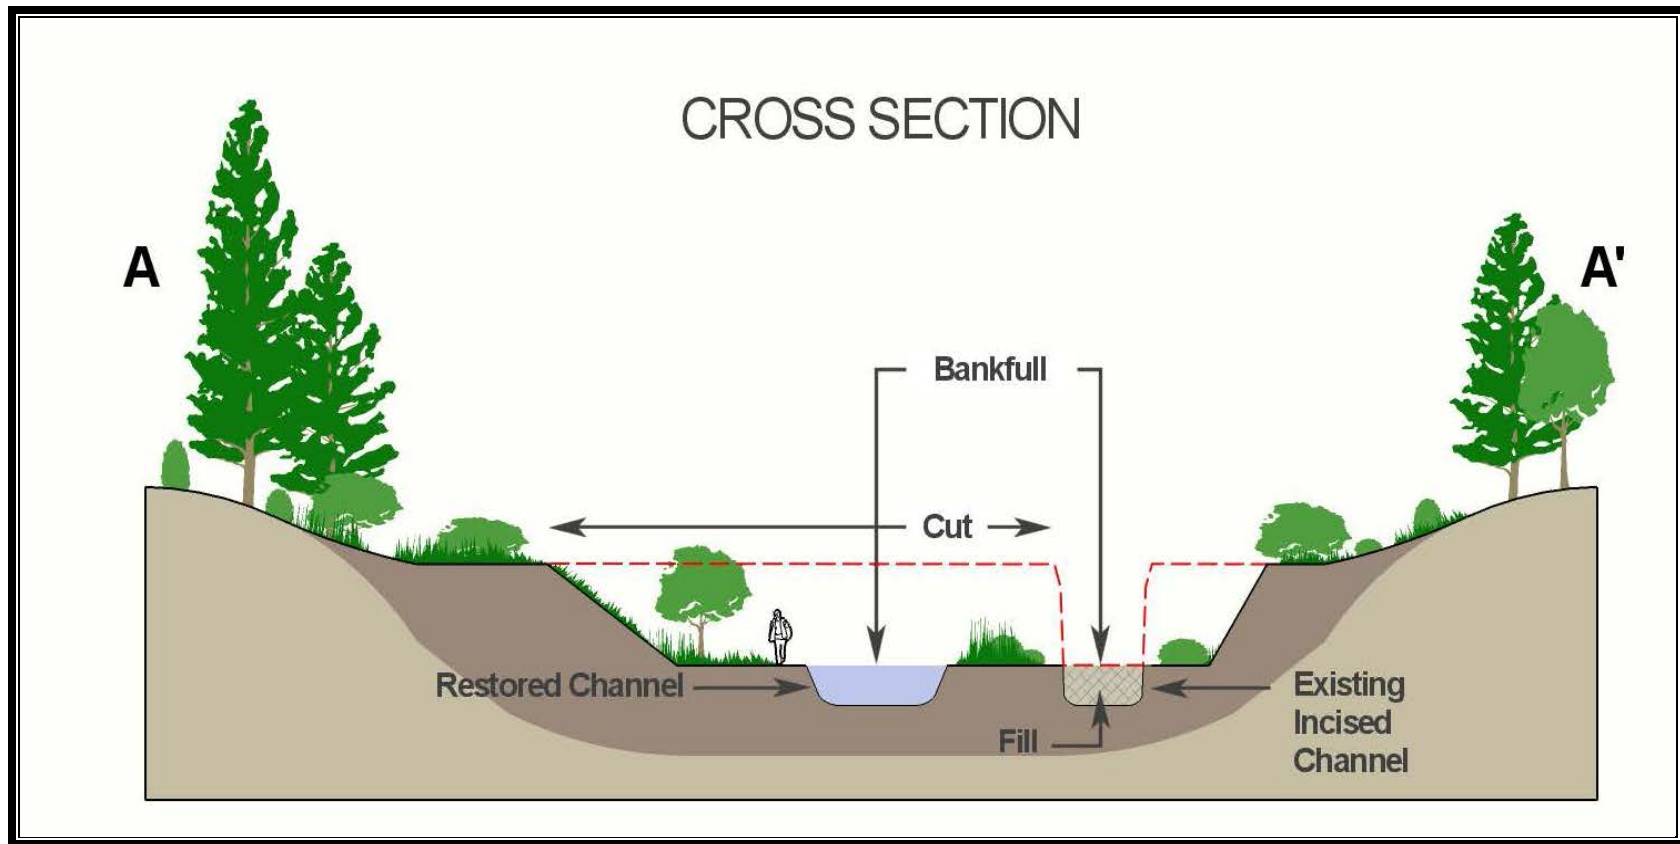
P2-FLOODPLAIN EXCAVATION APPROACH-CROSS SECTION VIEW
